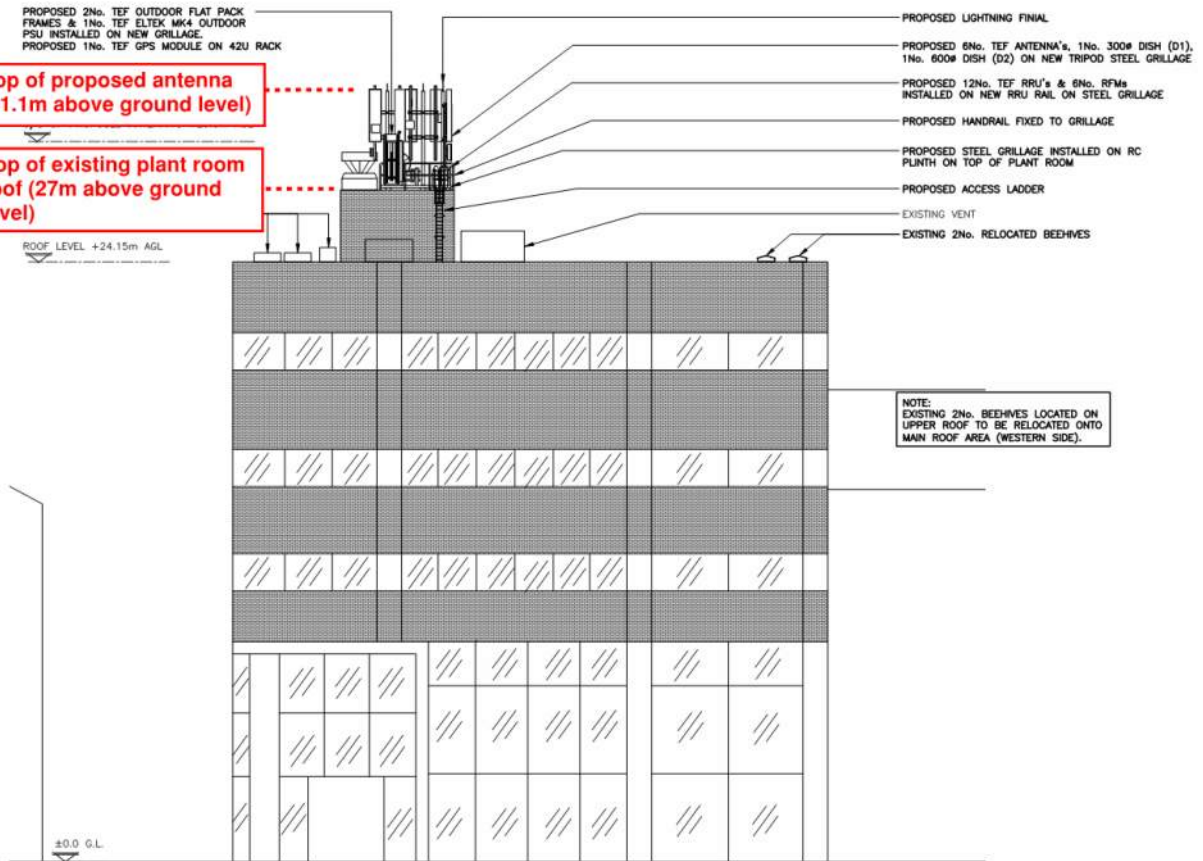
extract of proposed north-west (Shaftesbury Avenue) elevation drawing
